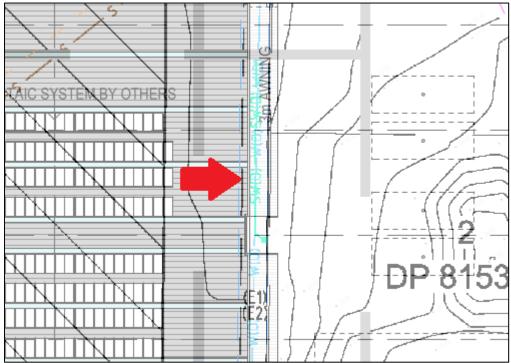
Extract of the overlaid survey plan and site plan showing the part of building D that has a height of 17.75m
